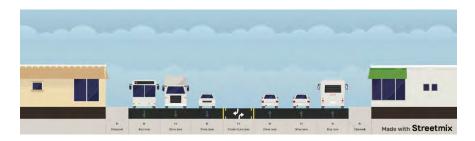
GRAND AVENUE TYPICAL SECTION: 13TH STEET TO 8TH STREET
